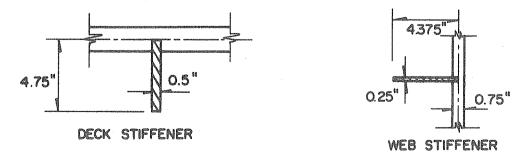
EXAMPLE 8 - DIMENSIONS OF ECCENTRIC RIBS
